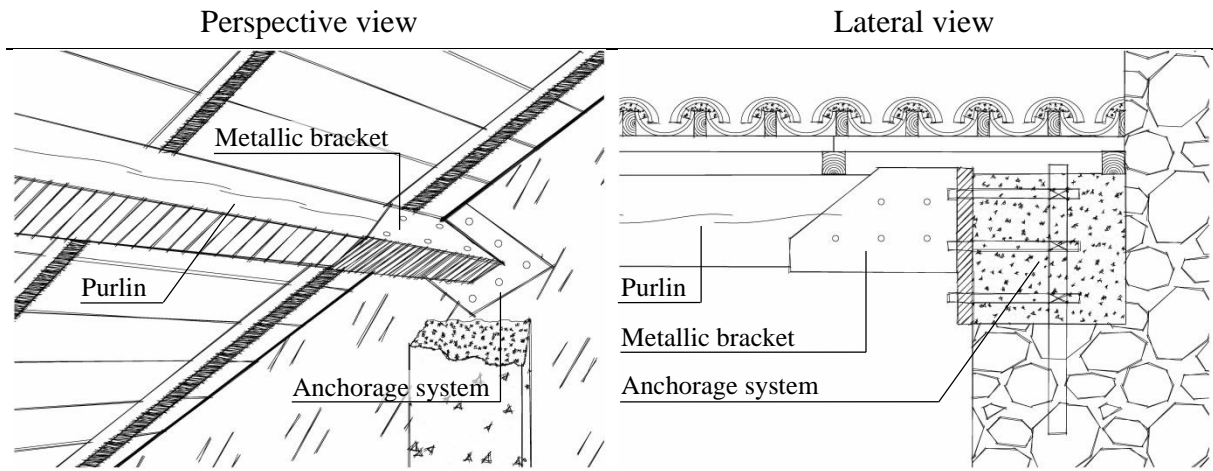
Strengthening of the purlin support with a bracket anchored in the masonry wall.
